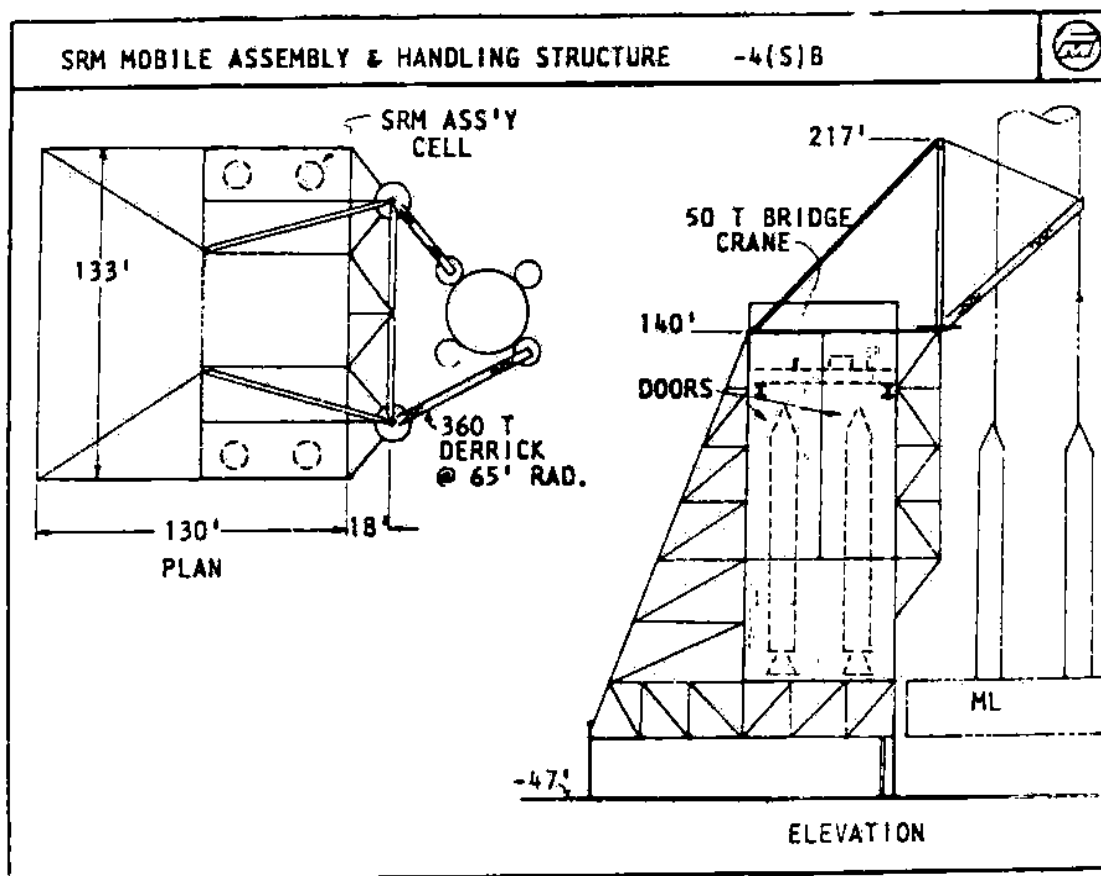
MOBILE ASSEMBLY AND HANDLING STRUCTURE
